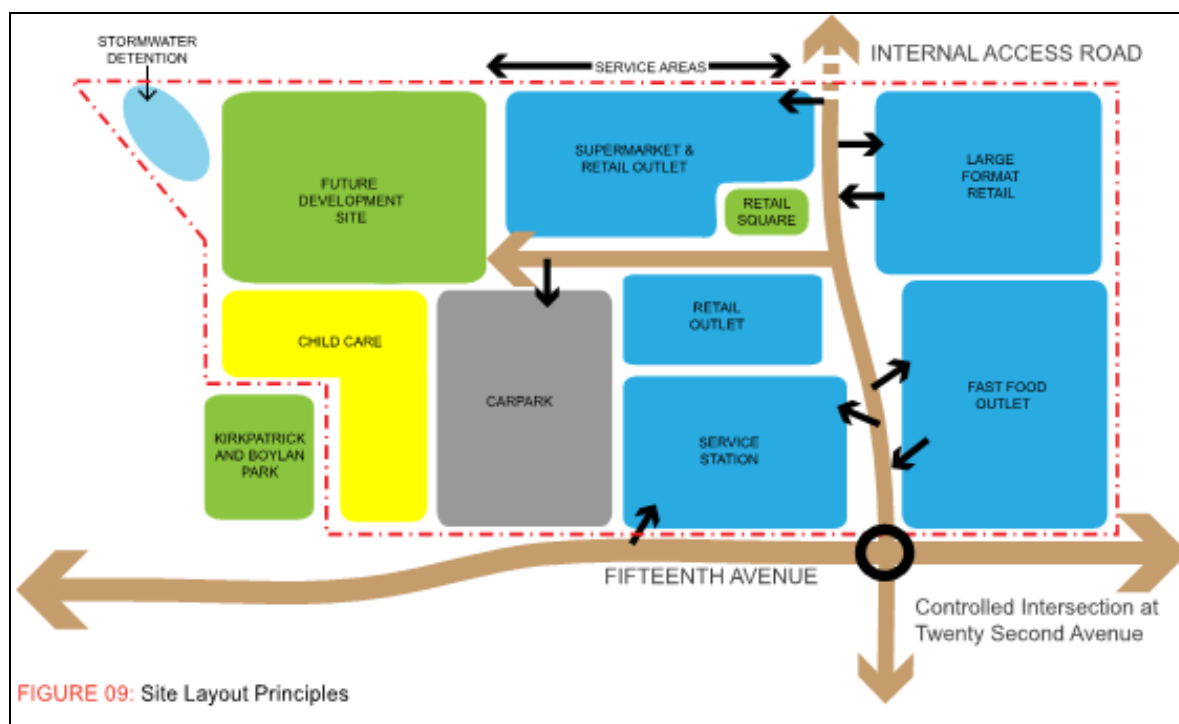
Site Layout Plan (Source: LFA, 2016)
